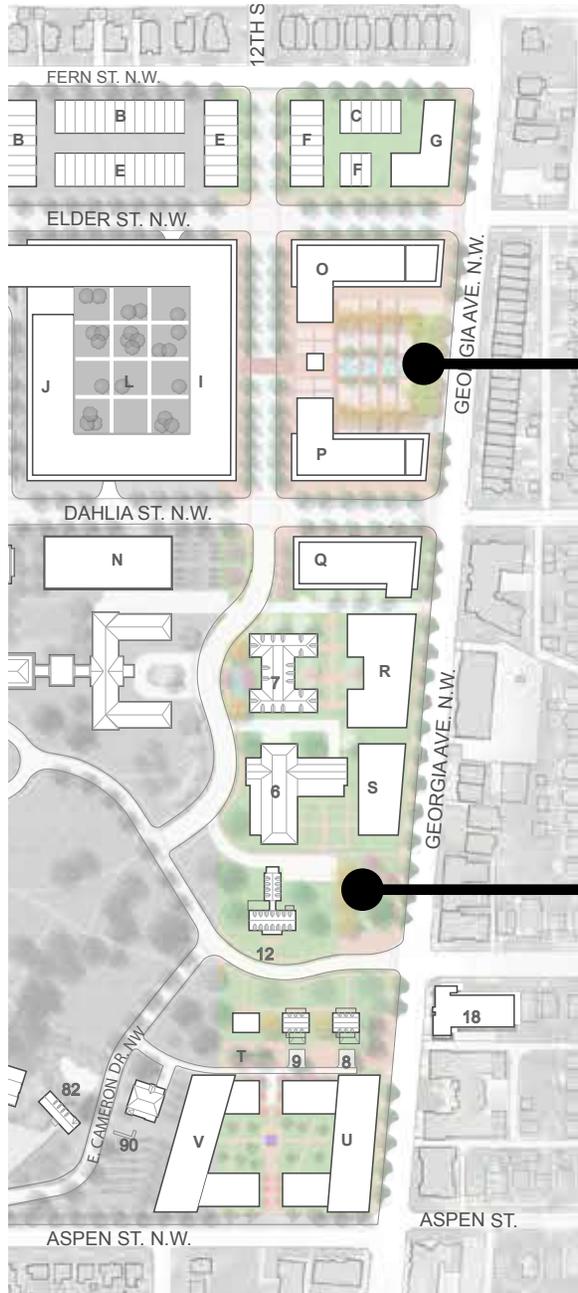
Sub-Area Key Plan - Georgia Avenue Frontage. Source: Perkins+Will.
